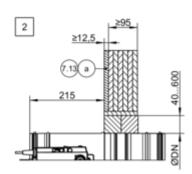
Dry mortarless installation into a timber wall or CLT wall, with a fire batt
